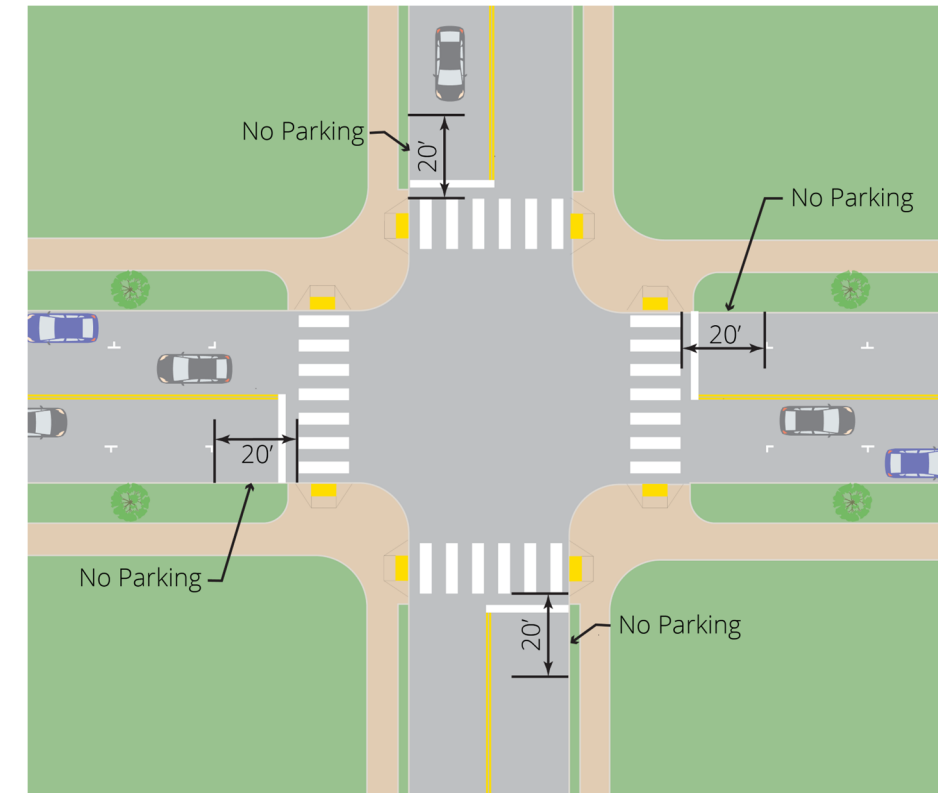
DAYLIGHTING AT A TYPICAL INTERSECTION
